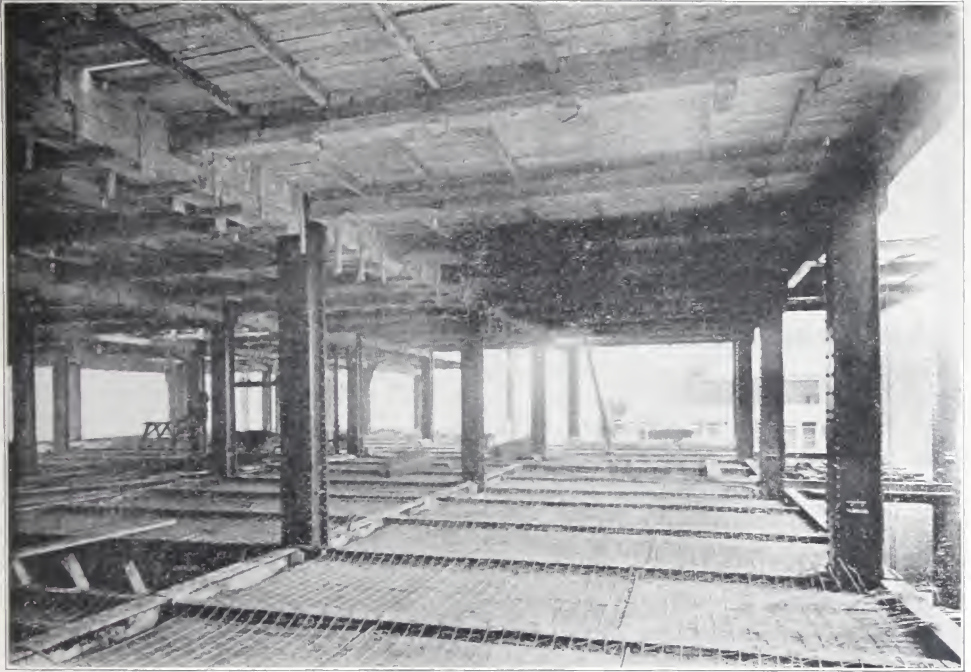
Stern Brothers Building, 23rd Street, New York City. Architects, Maynicke & Franke; Contractors, Thompson-Starrett Co. 230,500 square feet Triangle Mesh used in the floors of this building.
